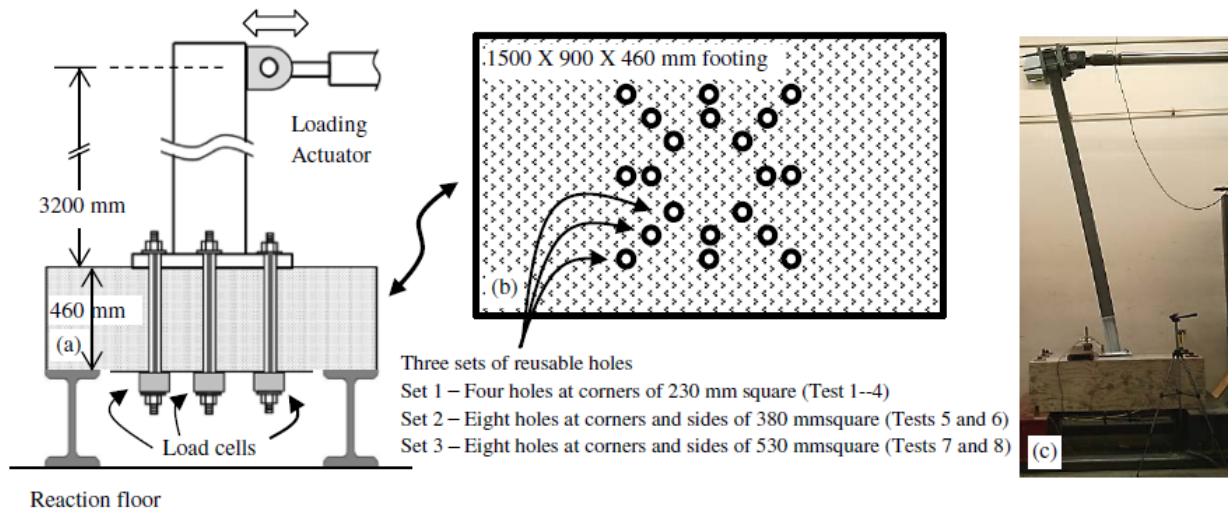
Test setup: (a) Schematic elevation; (b) Plan view; (c) Test in progress [28]
